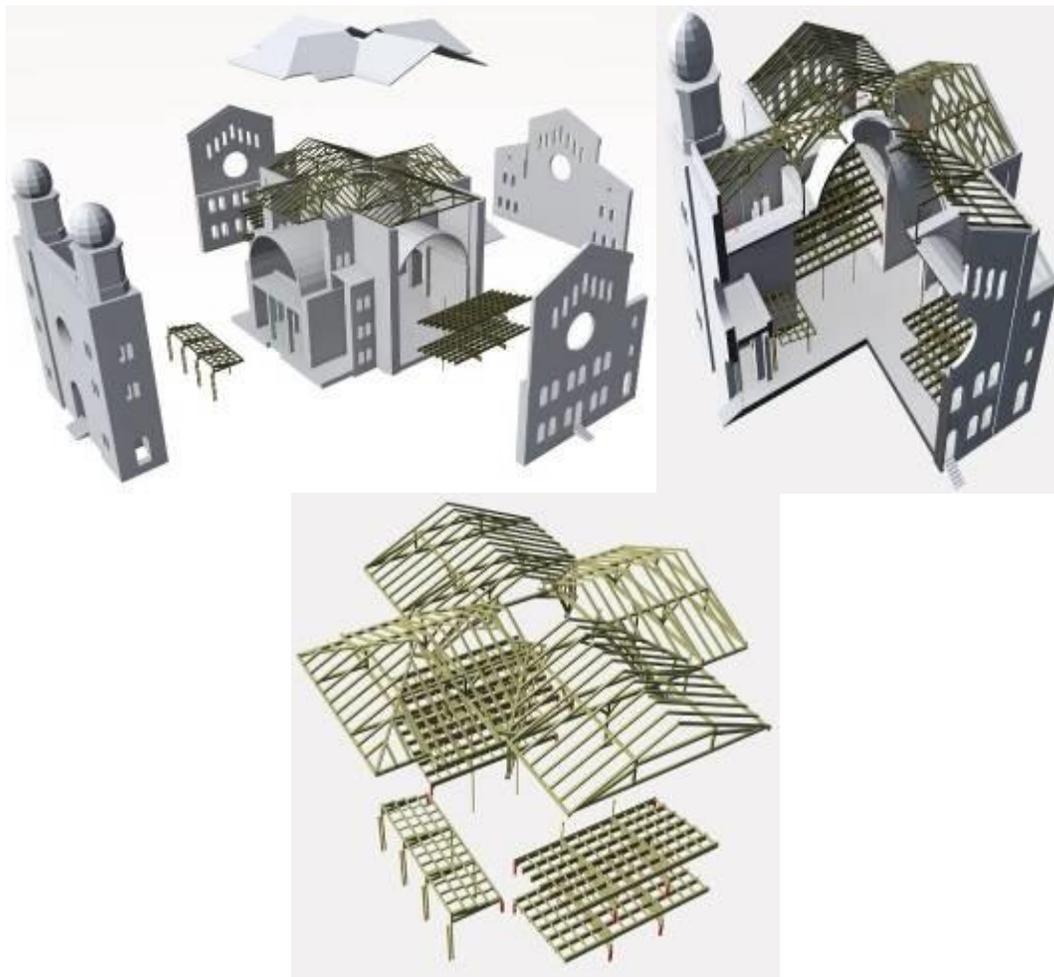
Arrangement of the load-bearing masonry walls and of the wooden elements at Timisoara Synagogue
